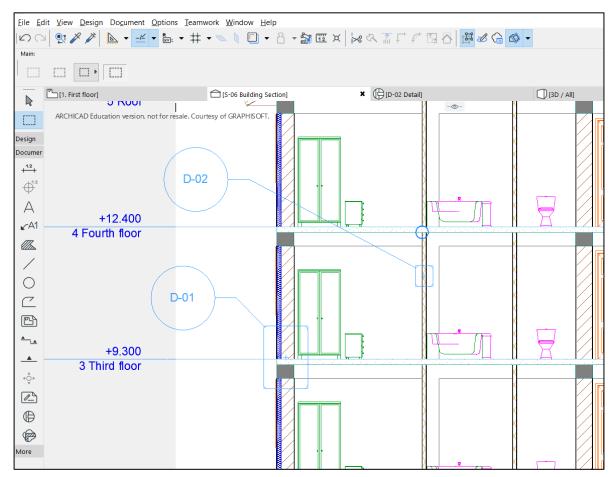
Screen capture showing the section of the MFH building. Source: (By Author)
